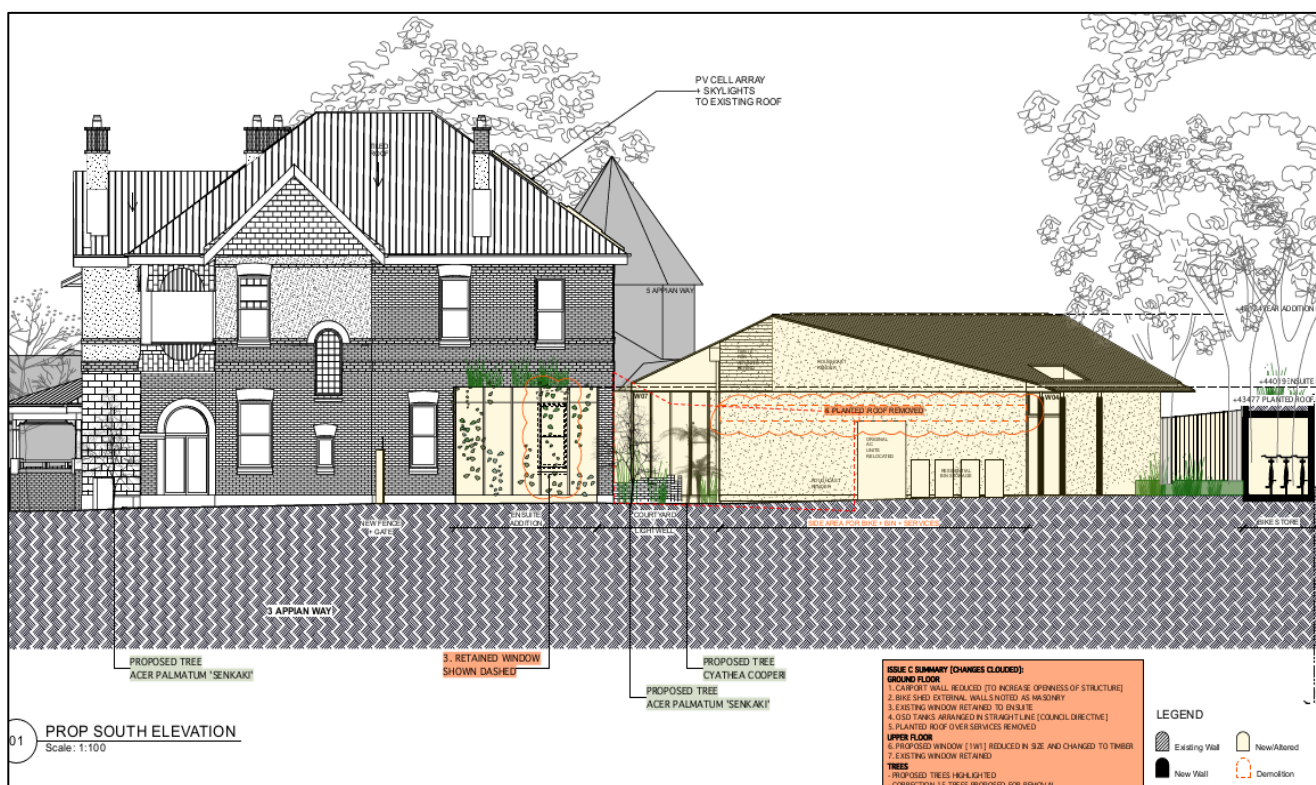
Extract of the applicant's submitted amended South Elevation. Source: (Some Commonplace)
